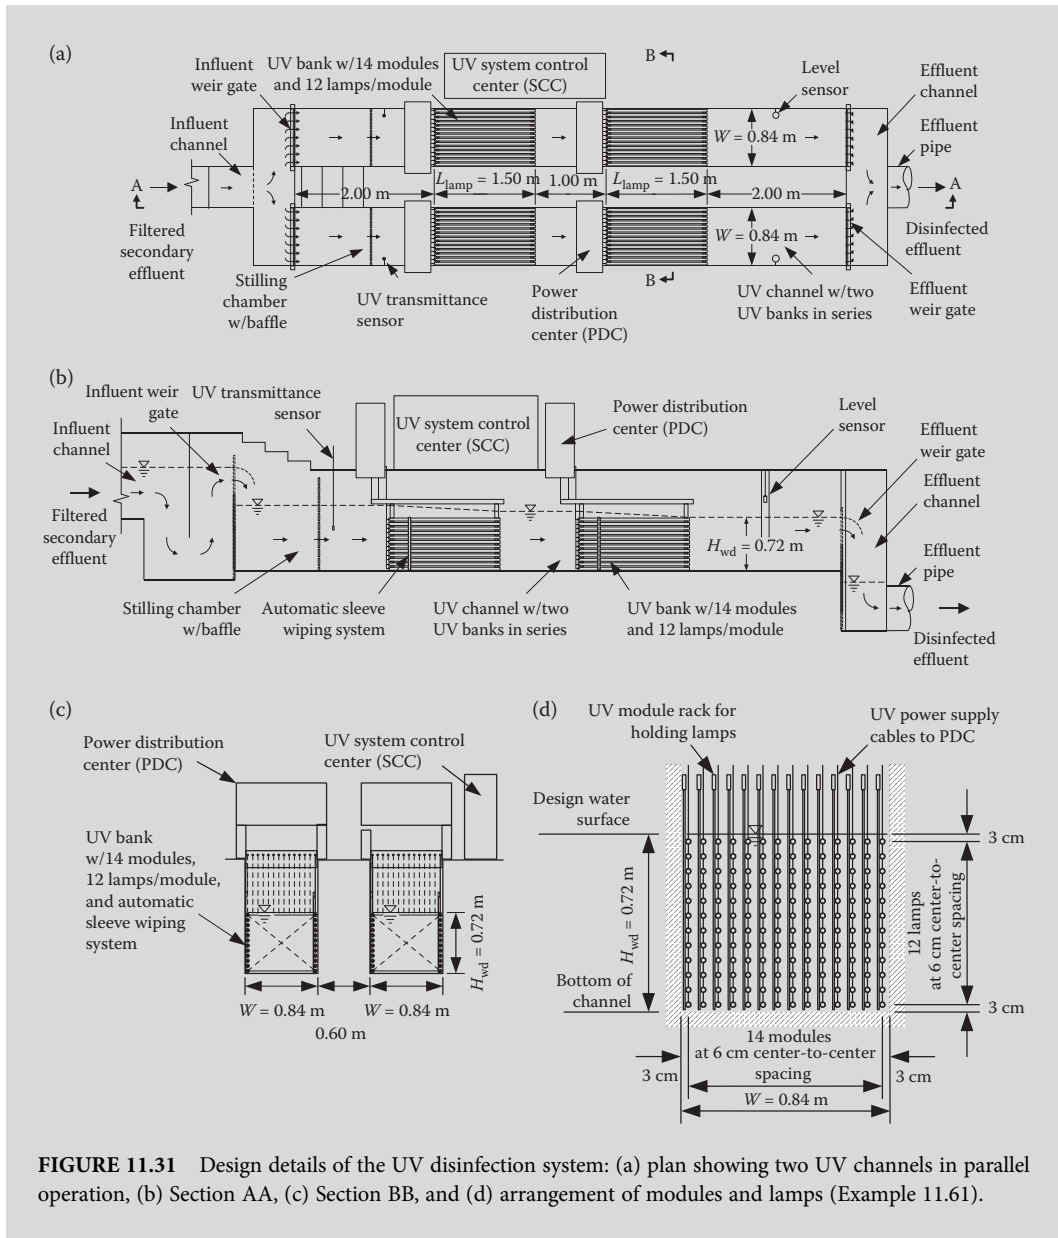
Design details of the UV disinfection system: (a) plan showing two UV channels in parallel operation, (b) Section AA, (c) Section BB, and (d) arrangement of modules and lamps (Example 11.61).
